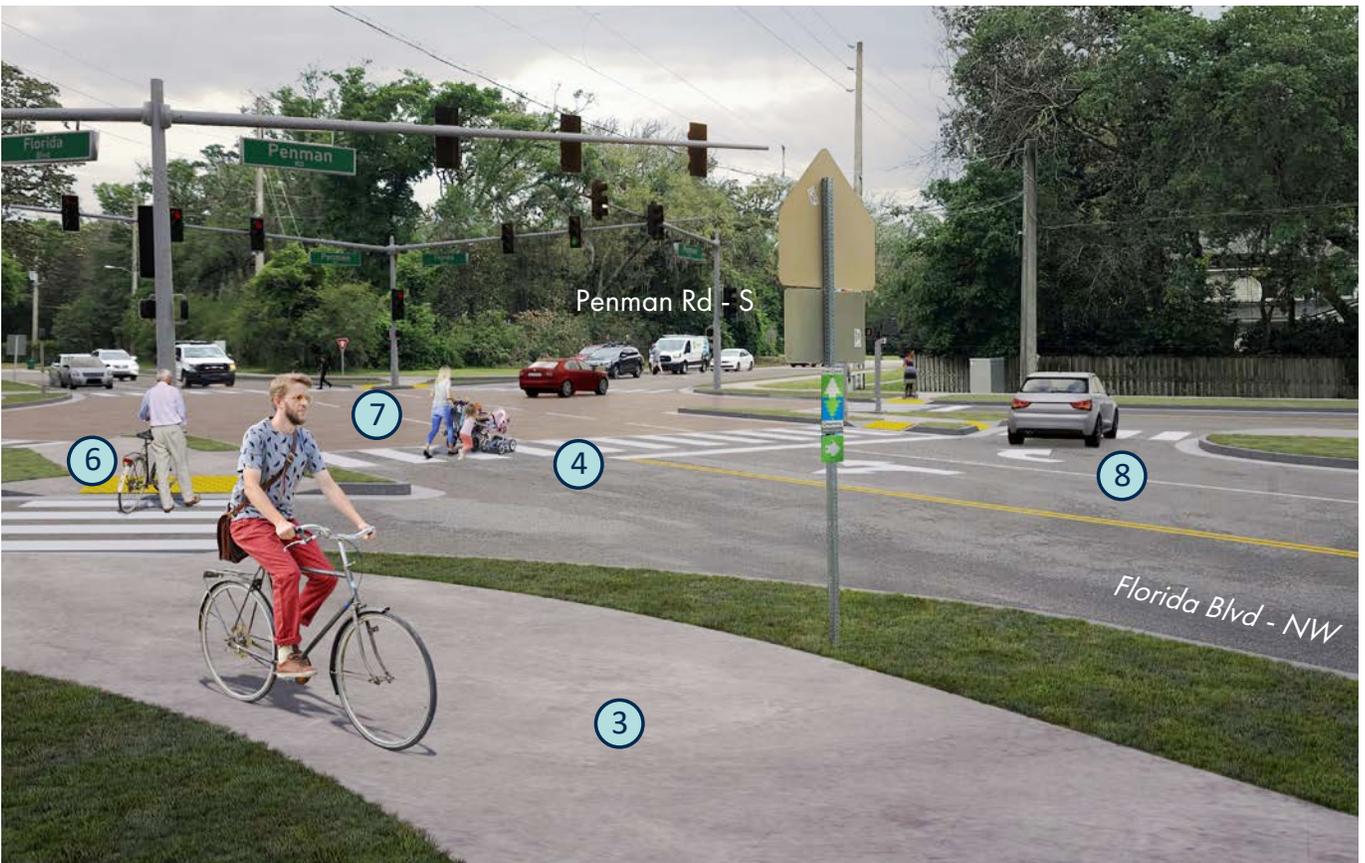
Penman & Florida Intersection: Proposed Signalized Intersection with Pavers
